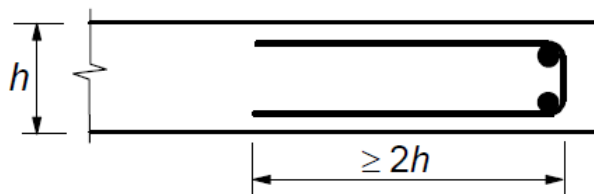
The normal reinforcement provided for a slab may act as edge reinforcement.
